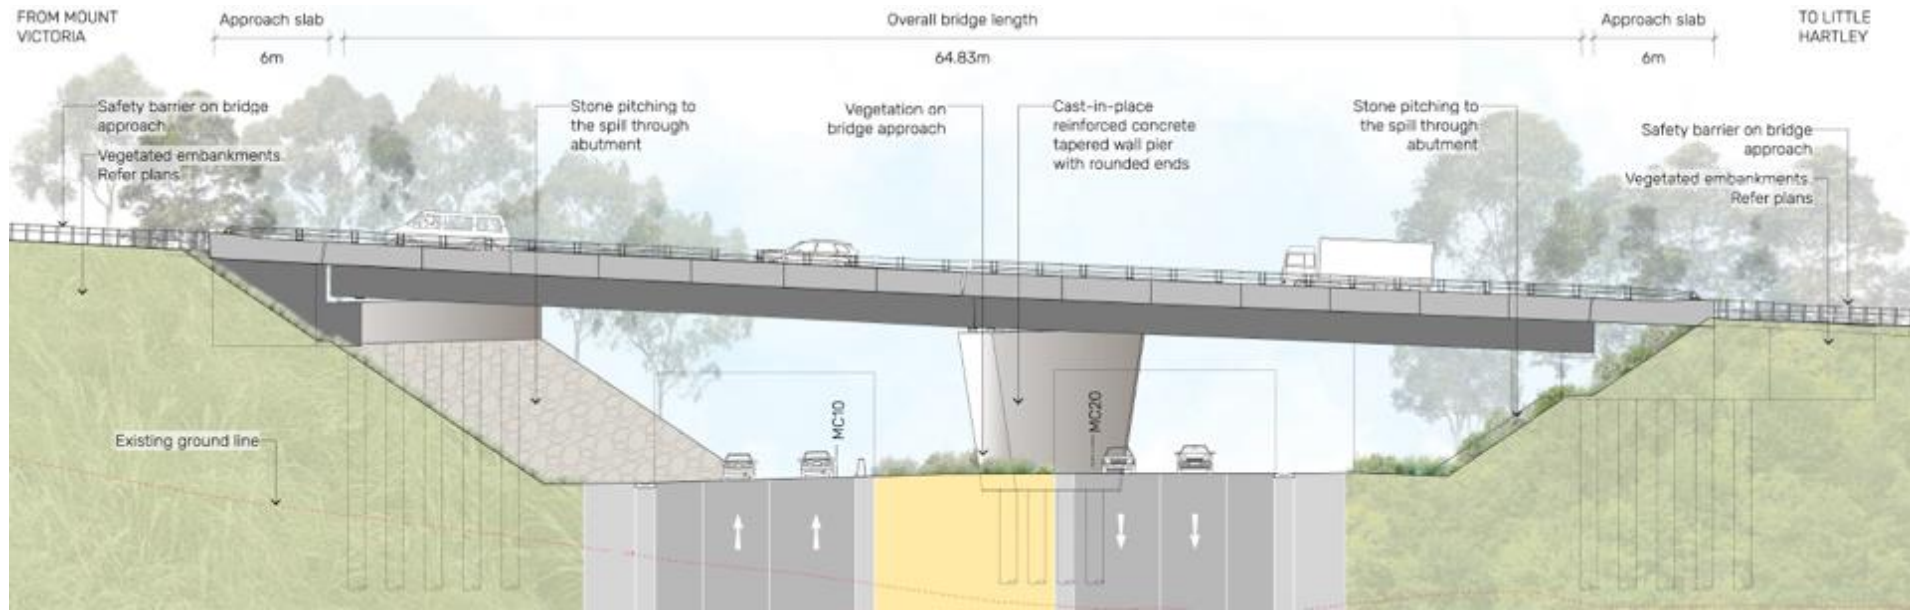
e Long section of Service Road 1 bridge over the Great Western Highway
